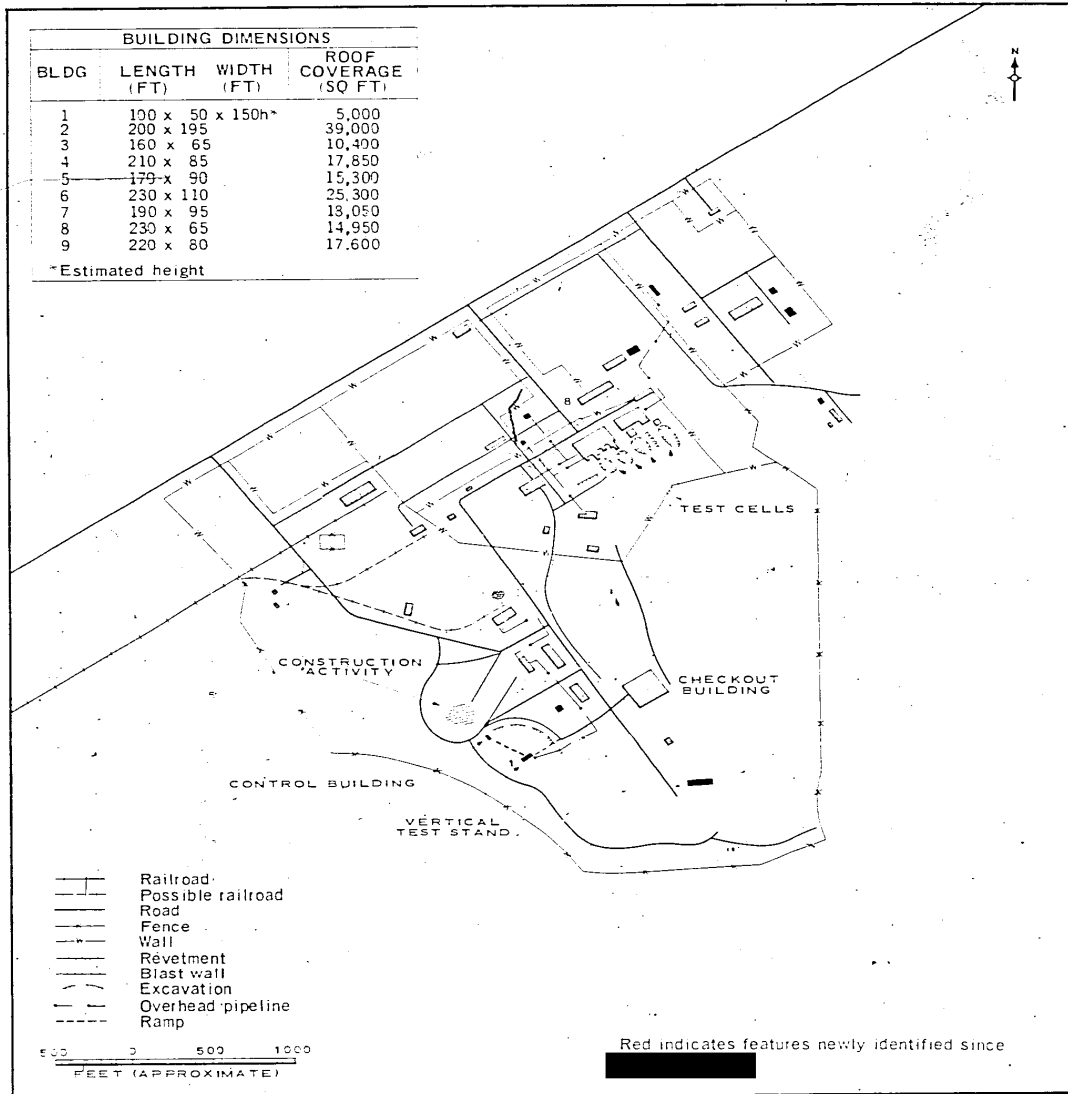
LAYOUT OF ROCKET TEST FACILITY.
